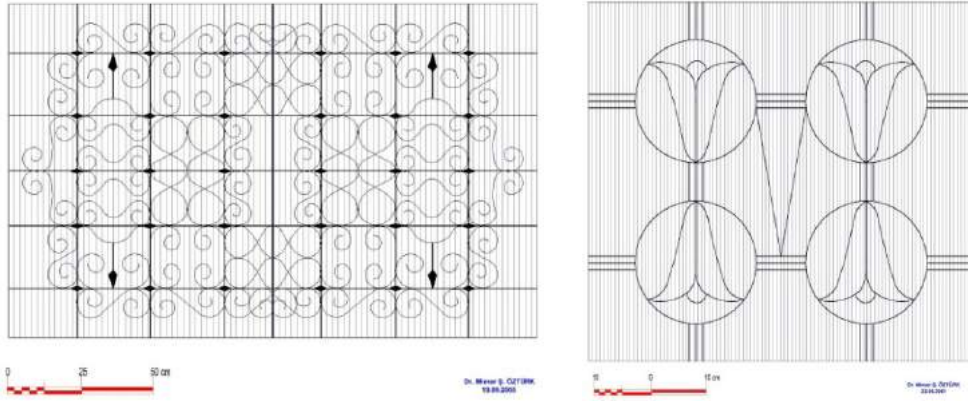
Polat Yörükoğlu House Entrance Door Metal Wrought Iron Details, drawn by author.
